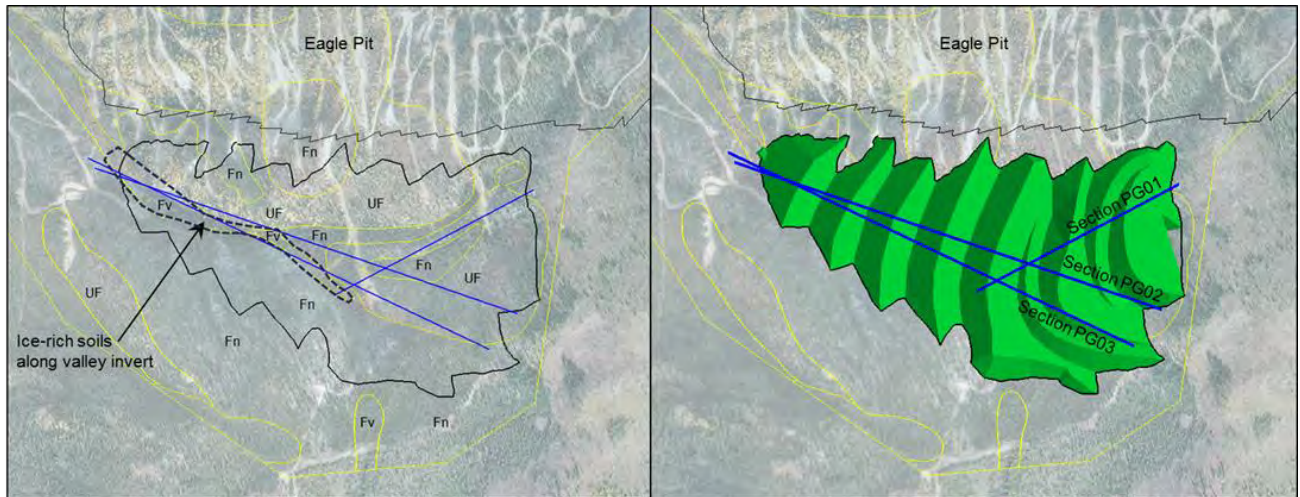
Location of Platinum Gulch WRSA Slope Stability Cross Sections
